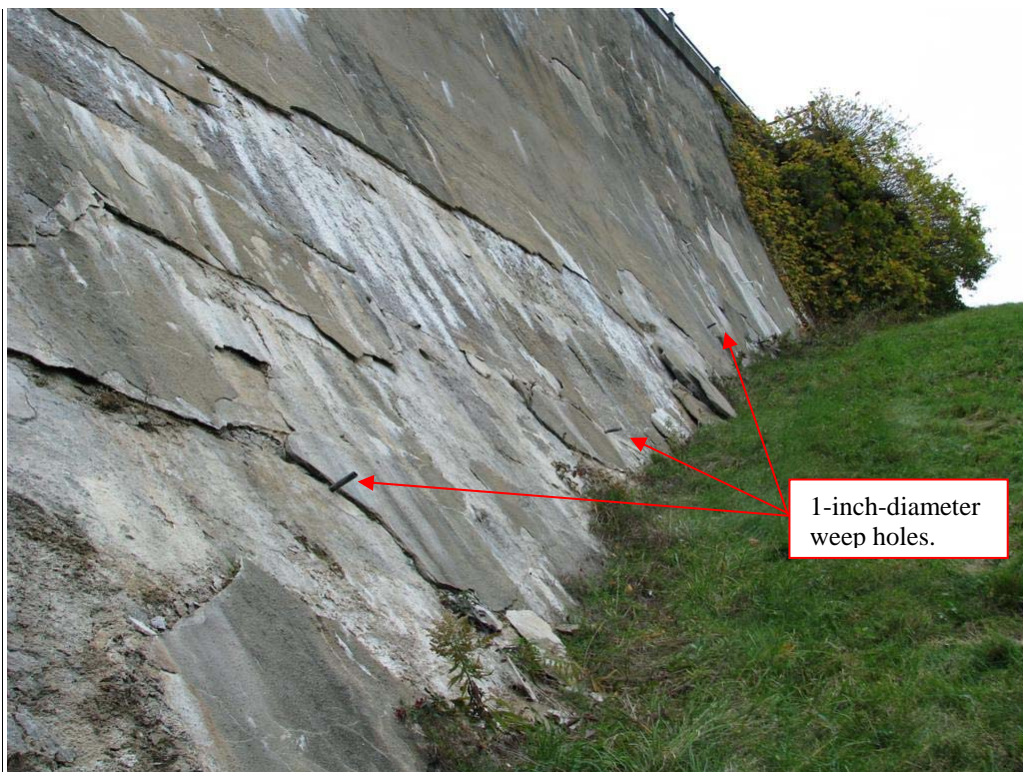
PVC weep holes on the downstream face of the dam to left of spillway. weep holes were installed when dam face was sandblasted and shotcrete-covered in 1987.
